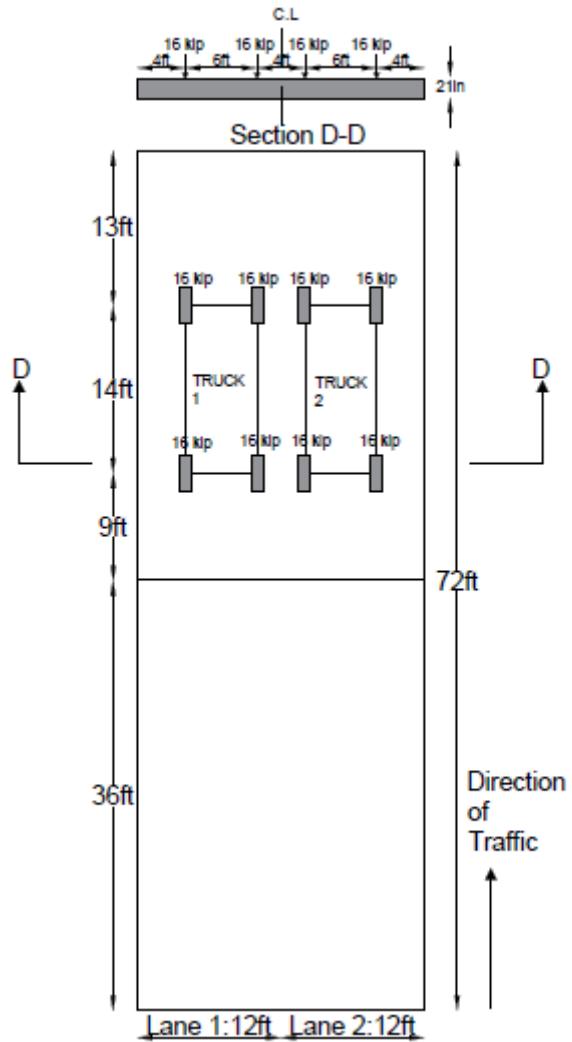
Typical Cross-Section and Plan of Two-Lane 36ft Span Bridge under Center-Lane Loading Condition (Negative moment).
